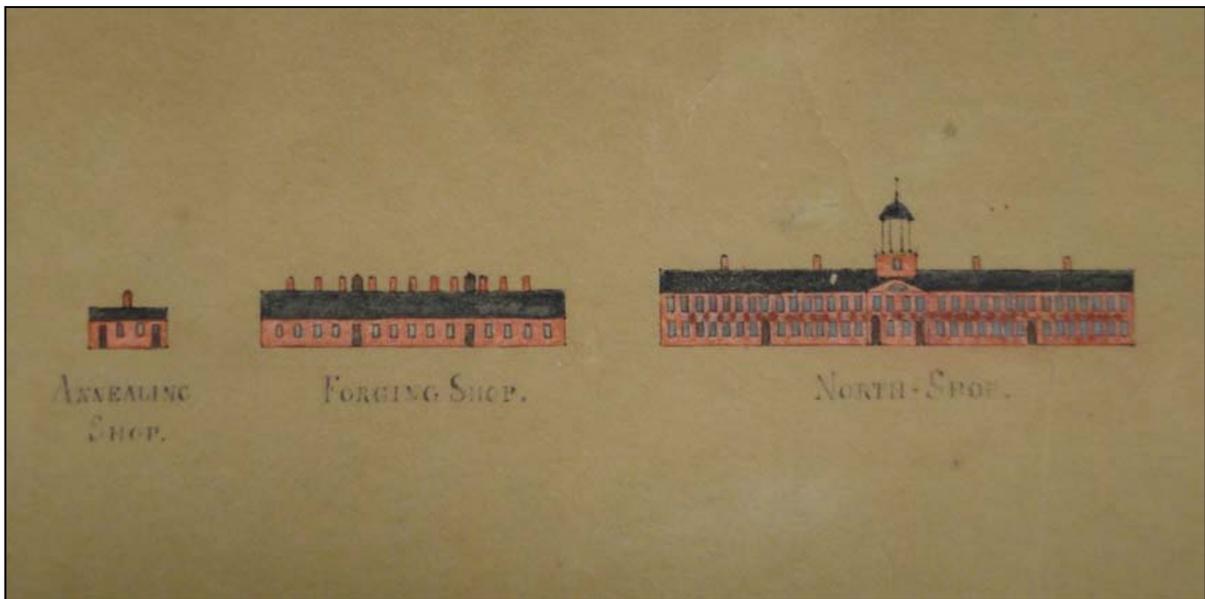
Elevations of “Annealing Shop,” “Forging Shop,” and “North Shop” from circa-1820 plan of U.S. Army.
